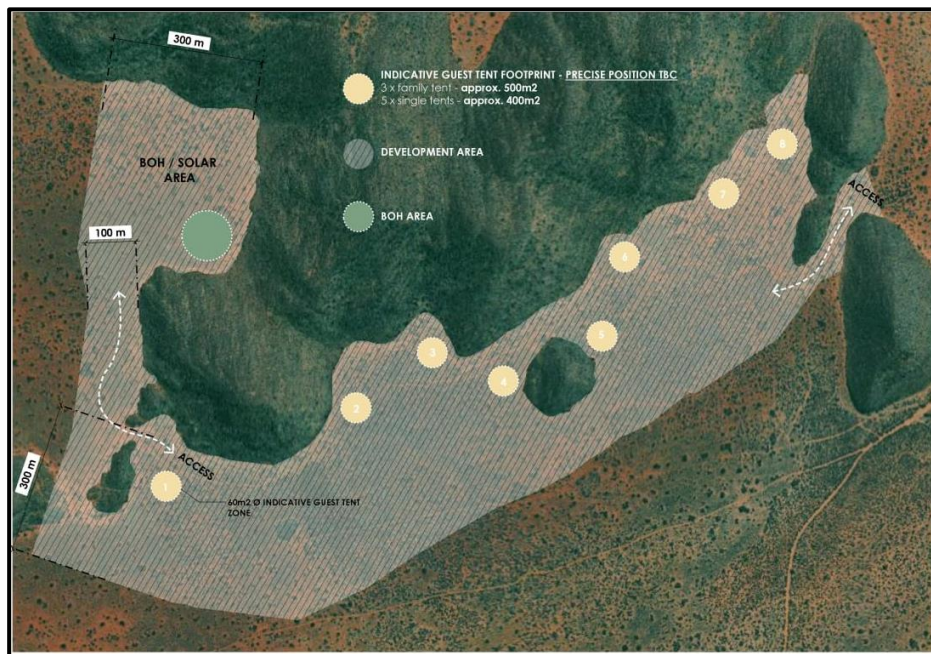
The Proposed layout of the new Tswalu Camp.
